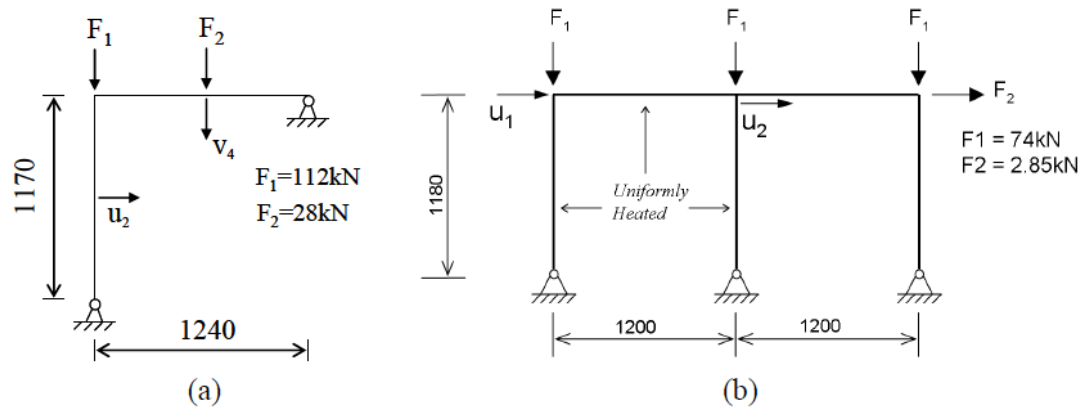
Schematic of the tested steel frames (mm): (a) frame EHR3; (b) frame ZSR1
